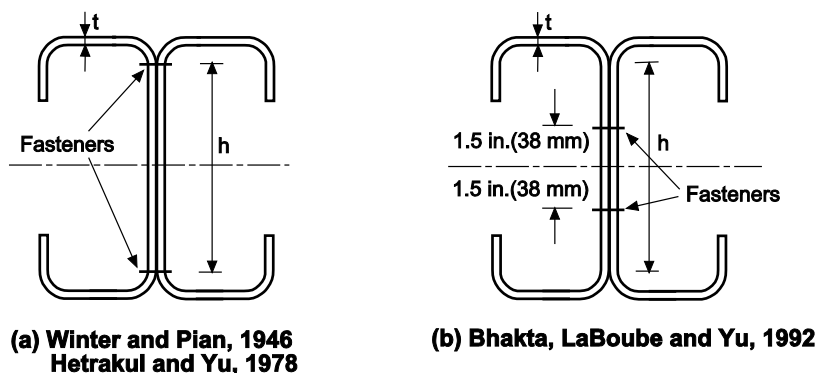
Typical Bolt Pattern for I-Section Test Specimens
